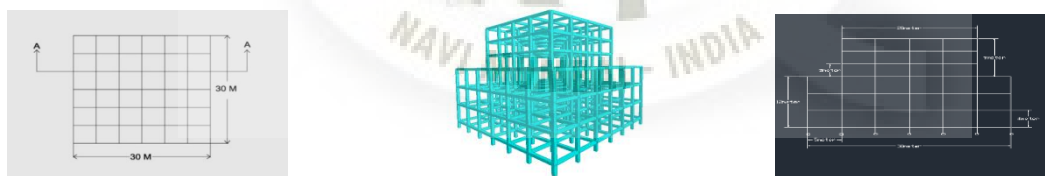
Plan, elevation and the rendered isometric view of Framed model⁽¹²⁾
